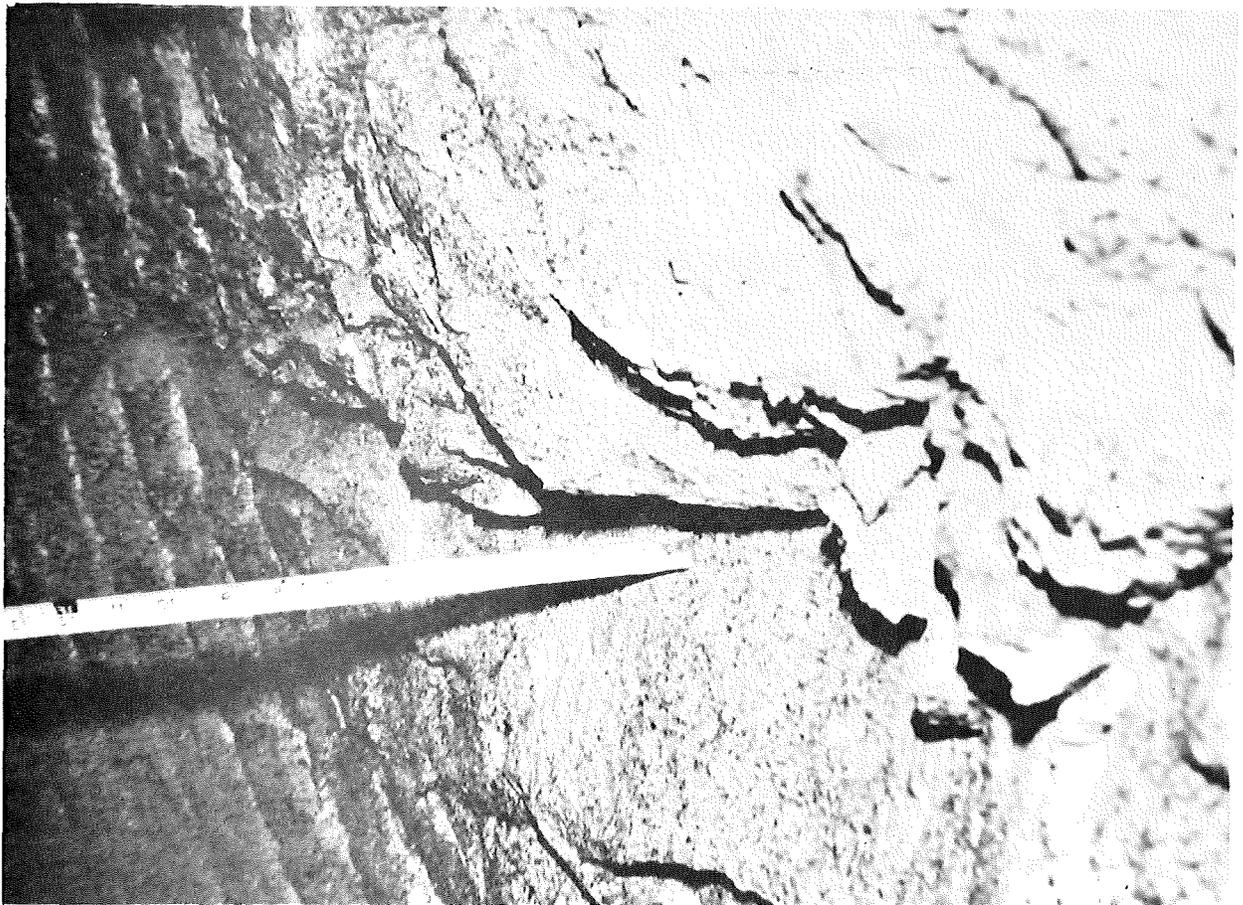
One of the More Severe Zones of Fractured Rock Encountered
